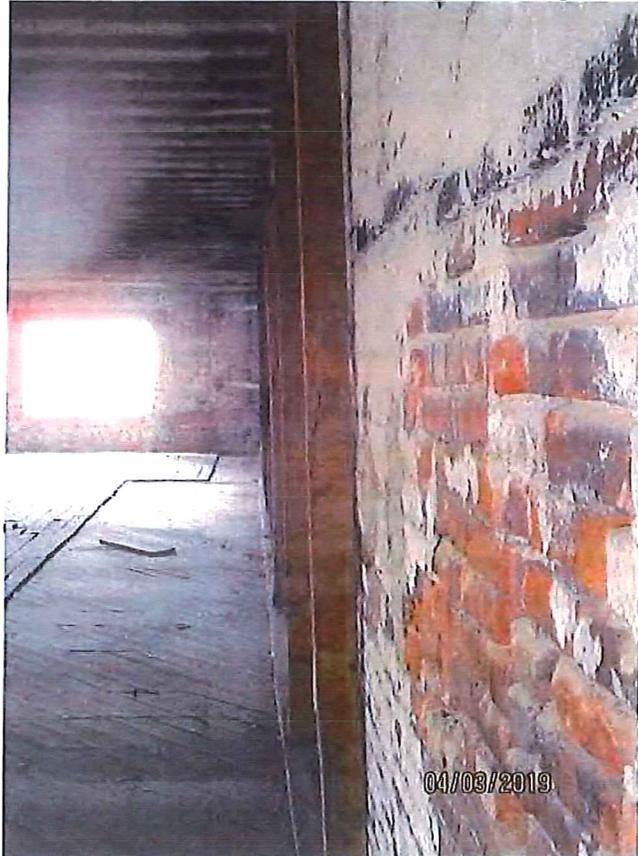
Typical wall movement at left sidewall on third floor.
